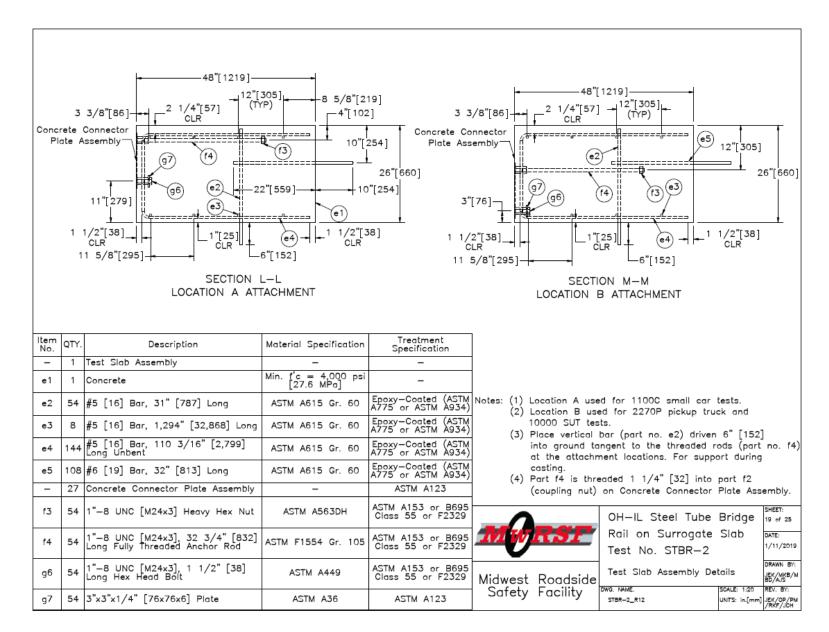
Test Slab Assembly Details, Test No. STBR-2
